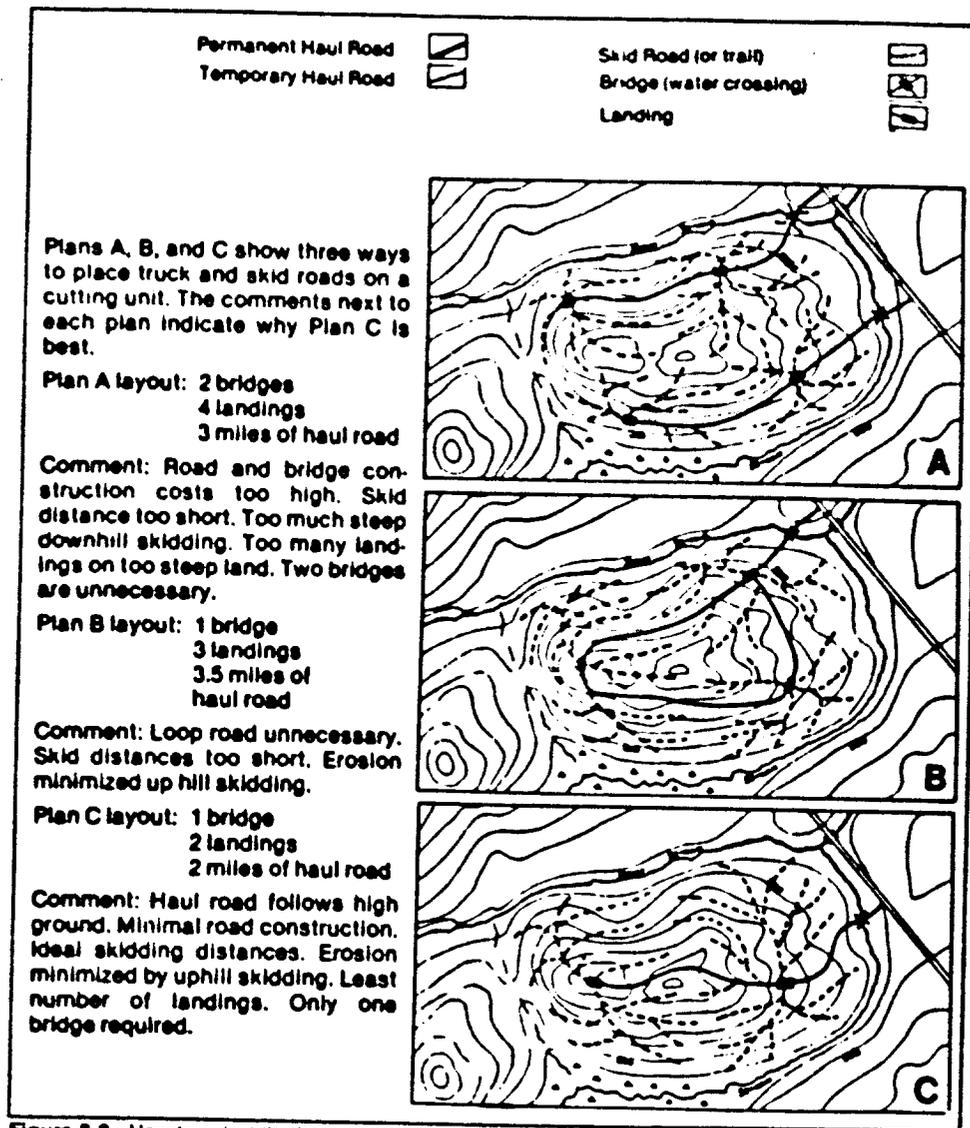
How to select the best road layout (Hynson et al., 1982).
